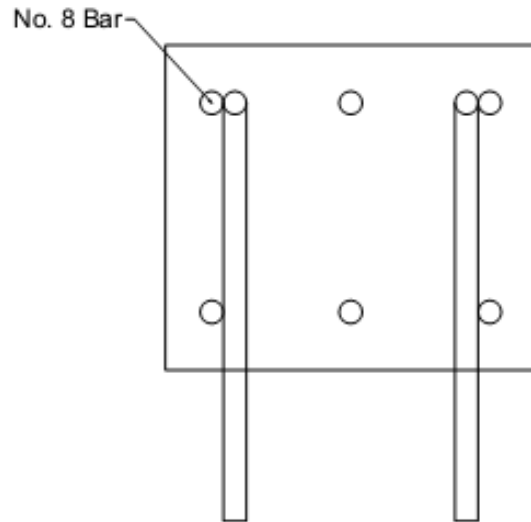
Longitudinal column reinforcement-6 No. 8 bars. Transverse reinforcement not shown.
